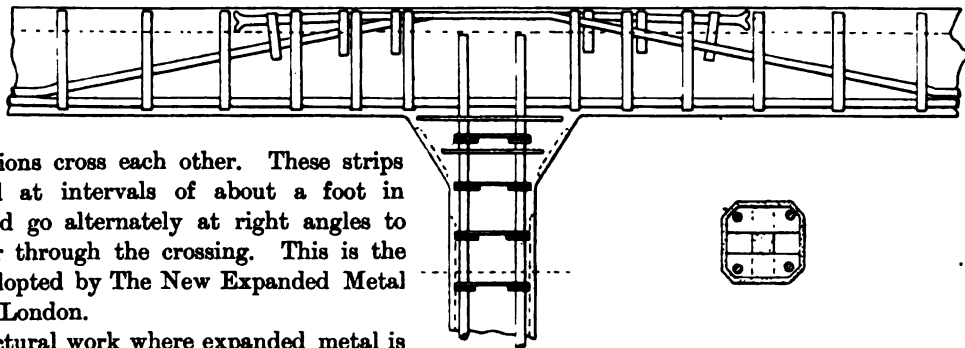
Pillar and Beam in Ferro-Concrete.
